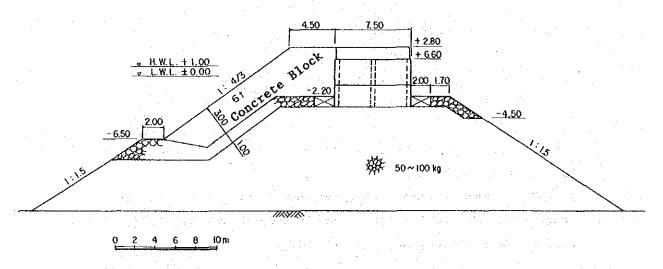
(2) Cross Section of Composite Breakwater with Concrete Blocks
